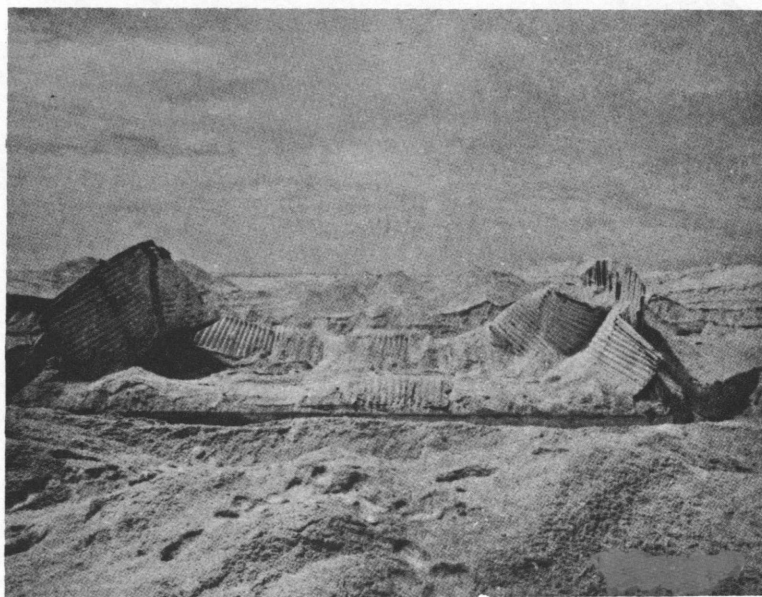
Structure 3.2b, side view, looking toward GZ.
